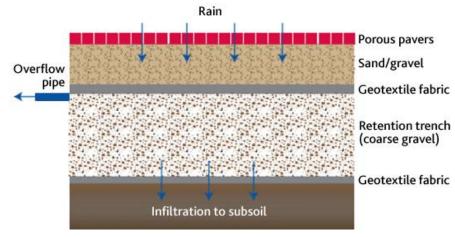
18 Cross-sectional profile of a porous pavement system; Image: Melbourne Water
